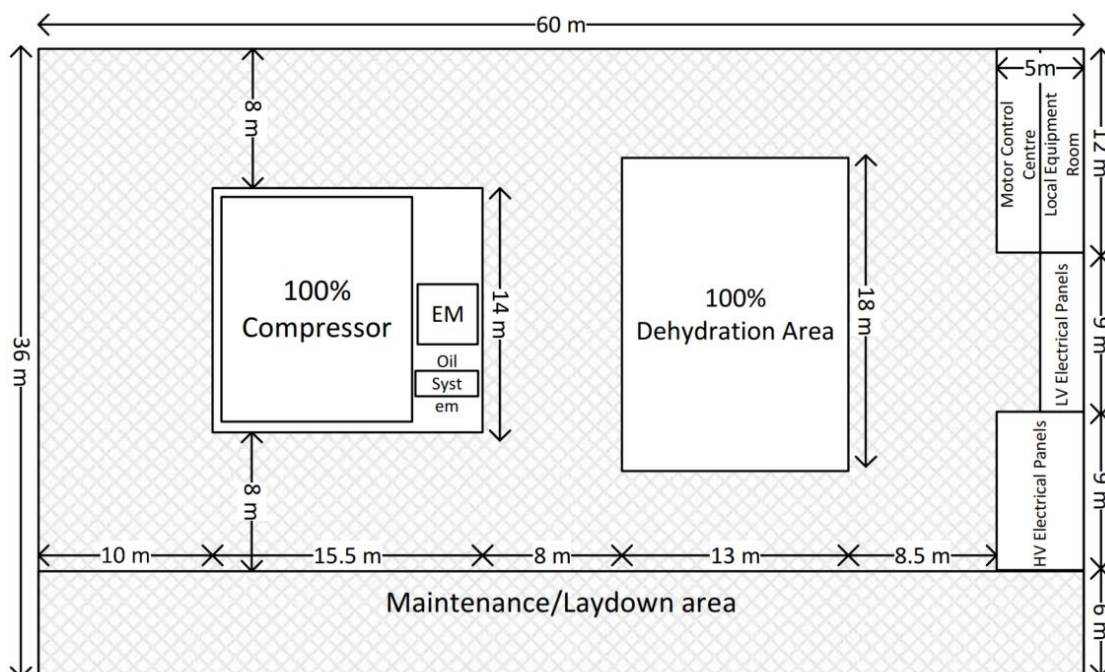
Compression and dehydration plant layout for the 1 x 100% case
